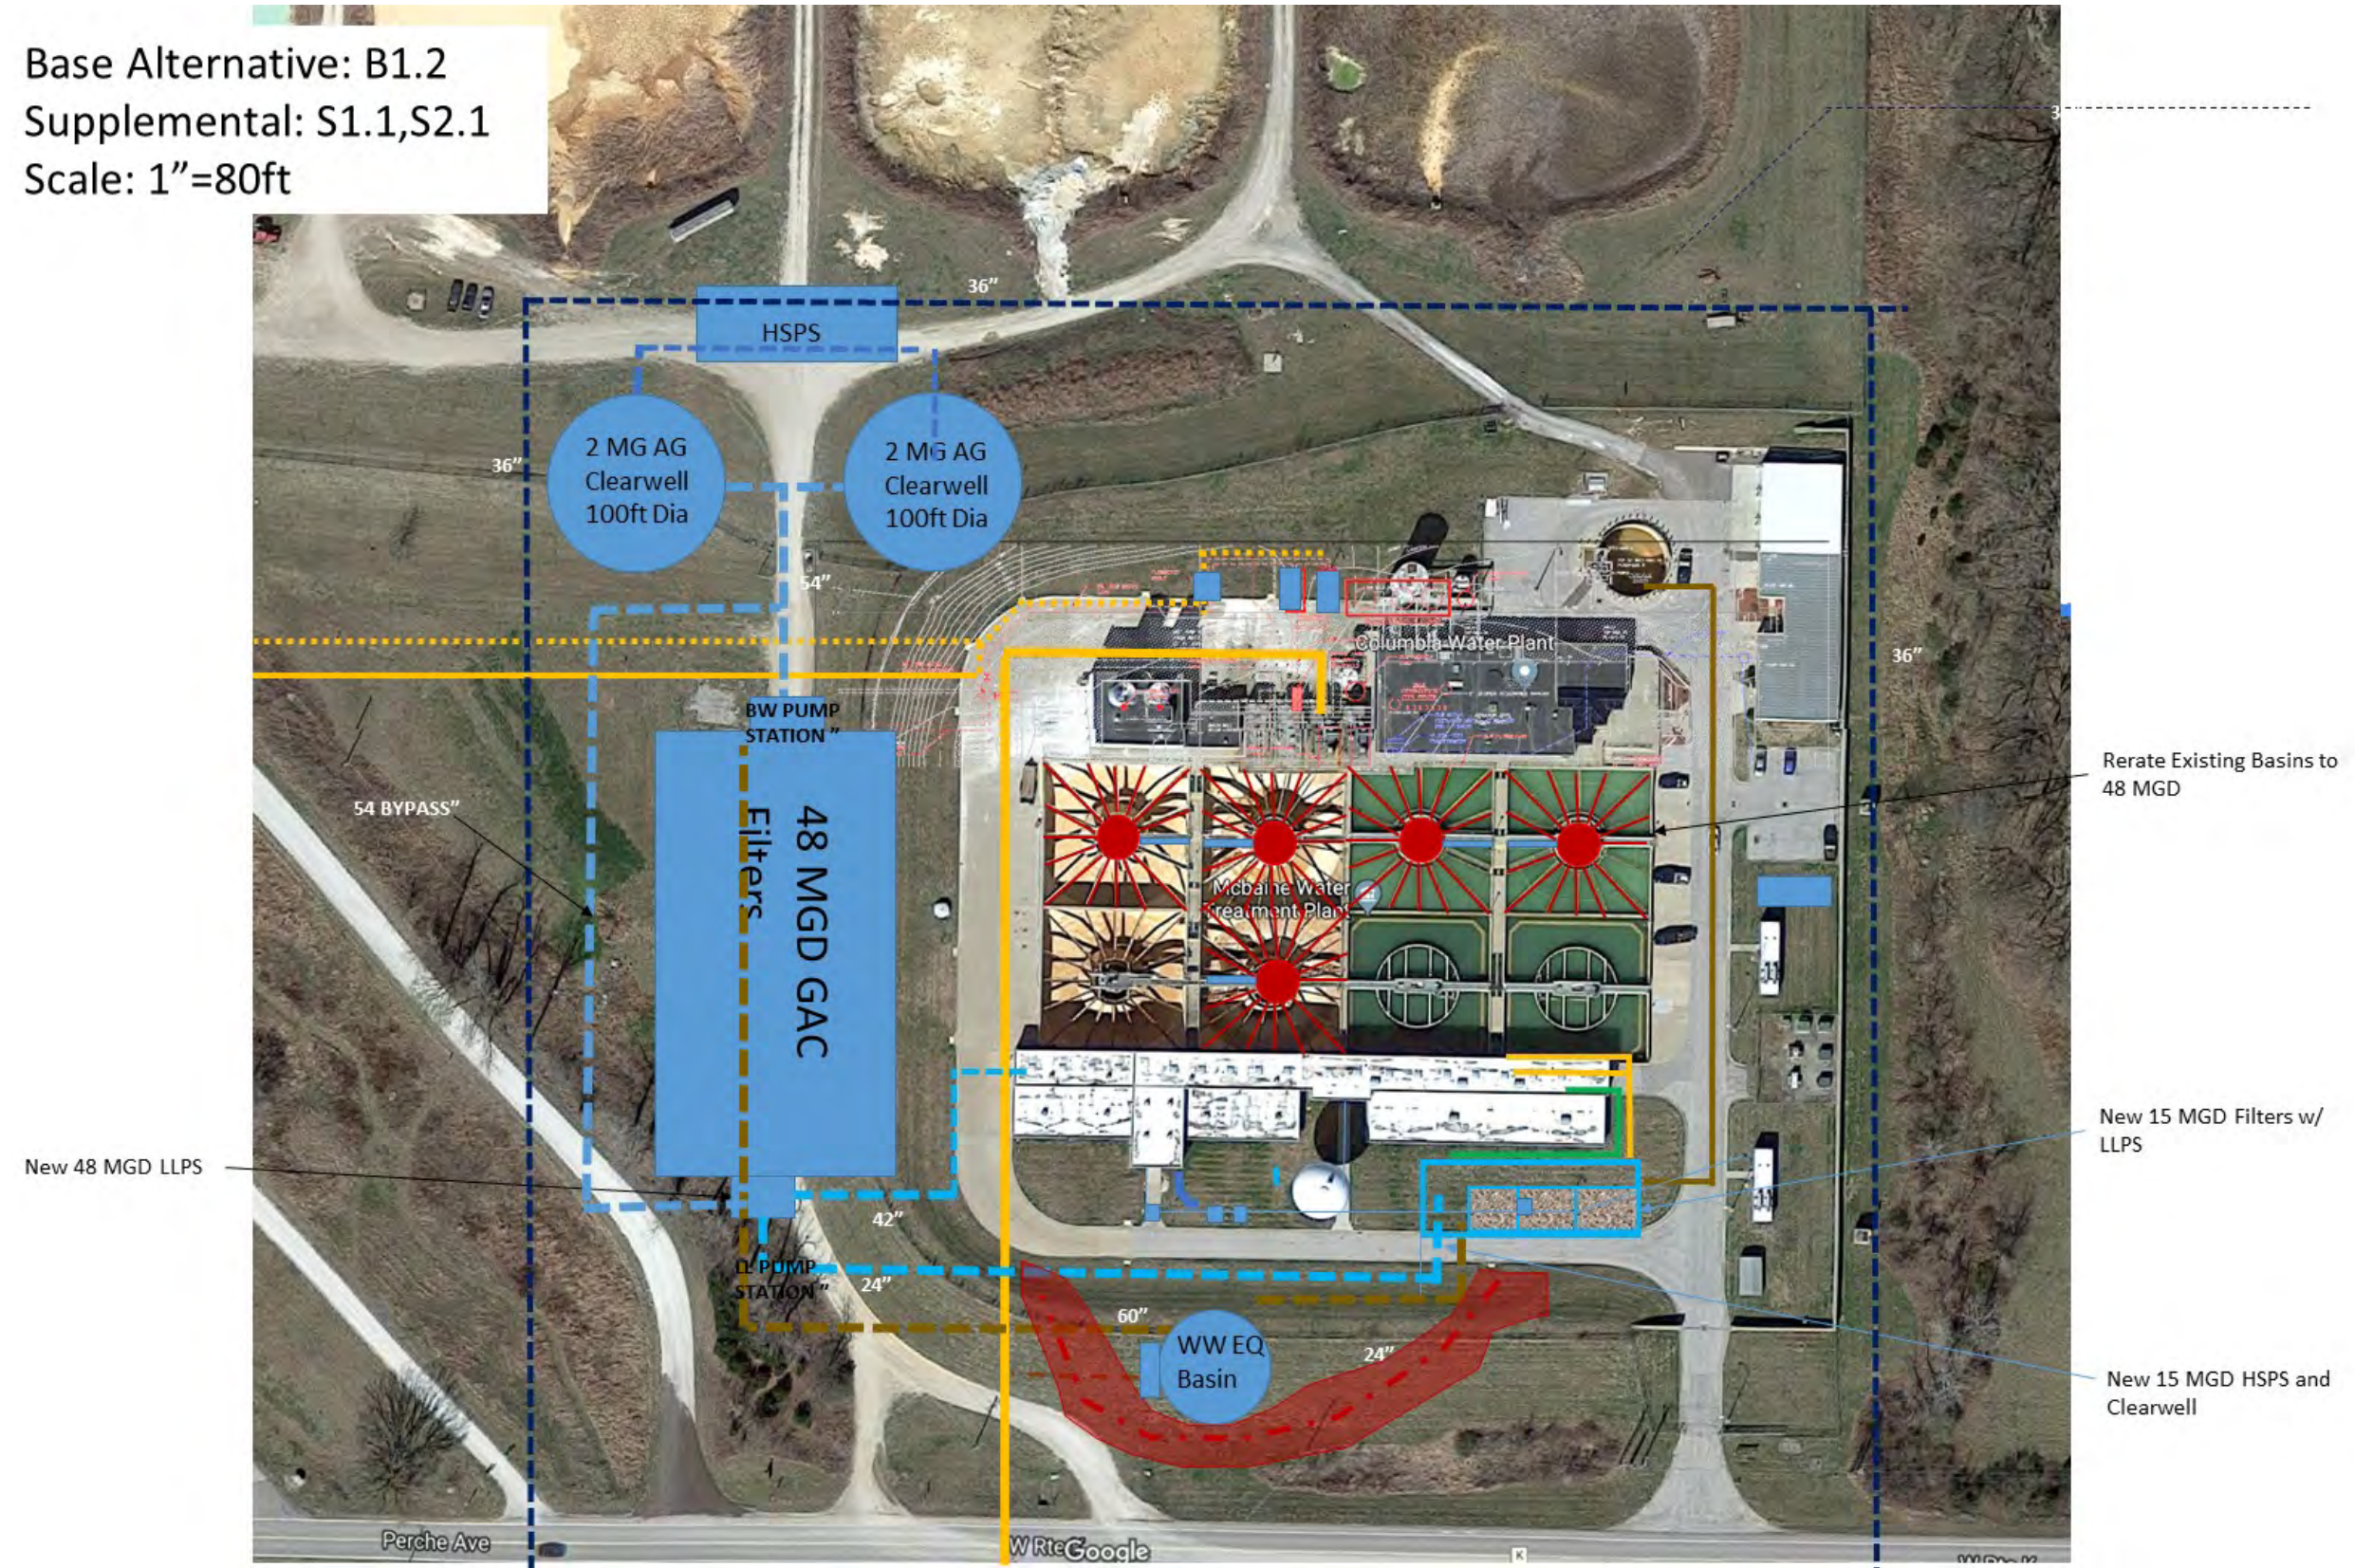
Alternative B1.2, S1.1, S2.1 Layout
